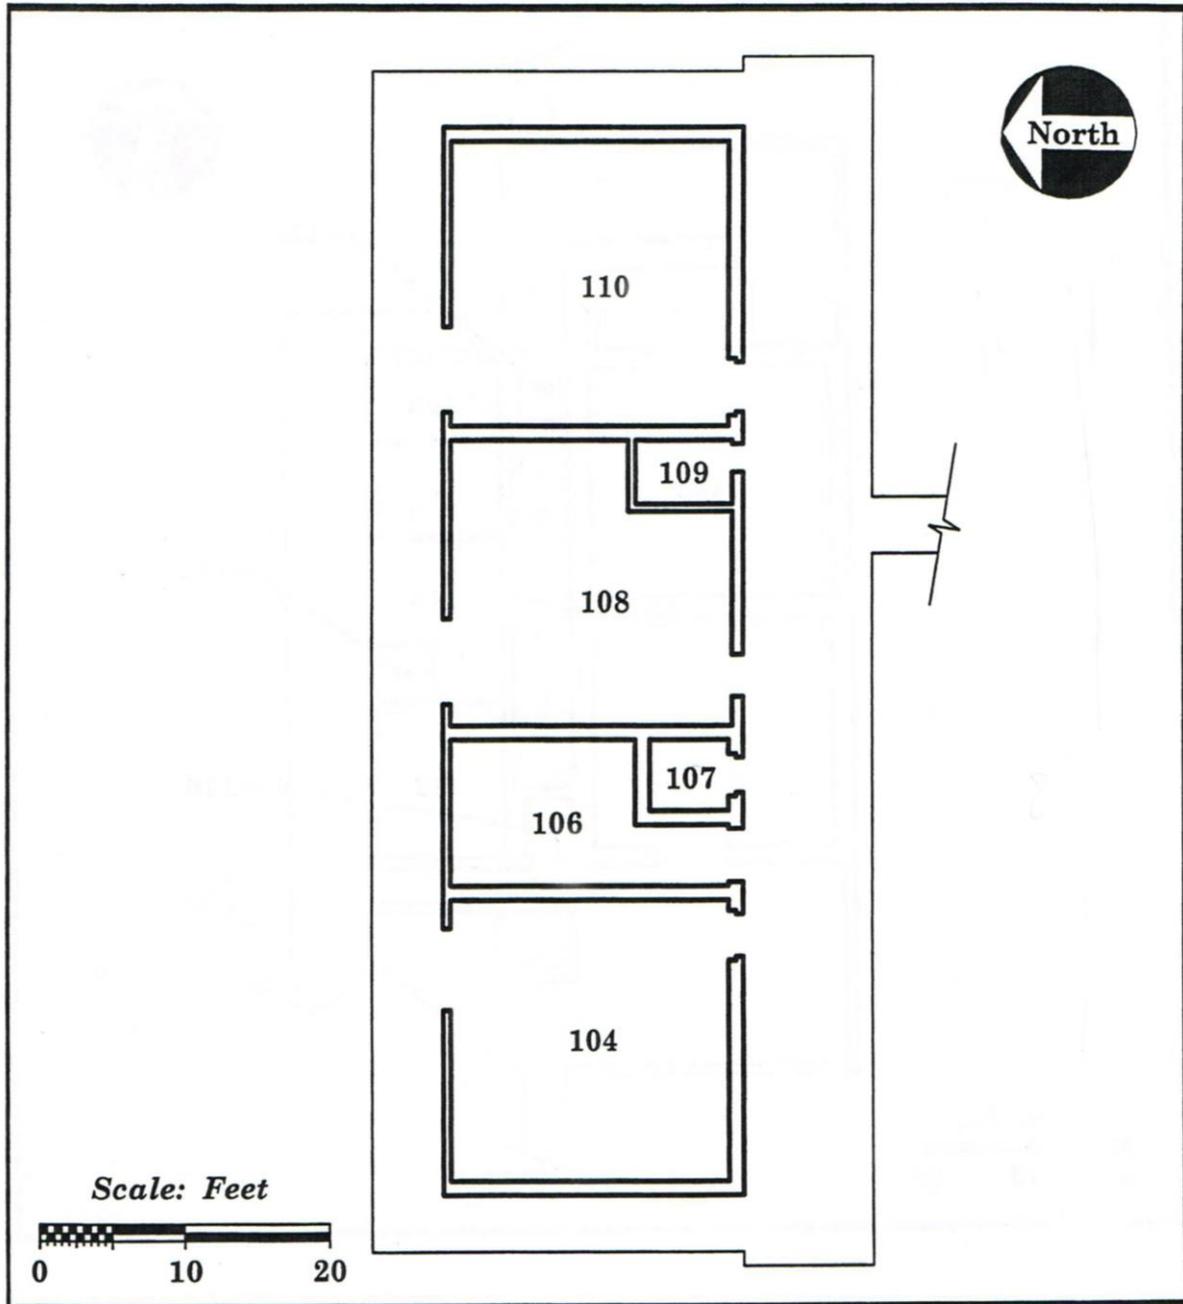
Building 807, Facility Floor Plan, 1997. LLNL Archives. (Figure A-3)
